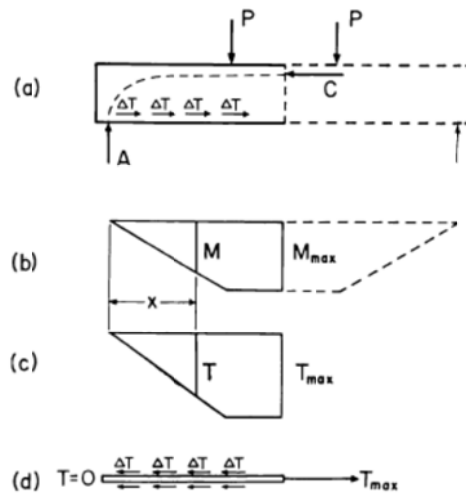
Internal forces of a reinforced concrete beam with bond (Kani, 1964).
